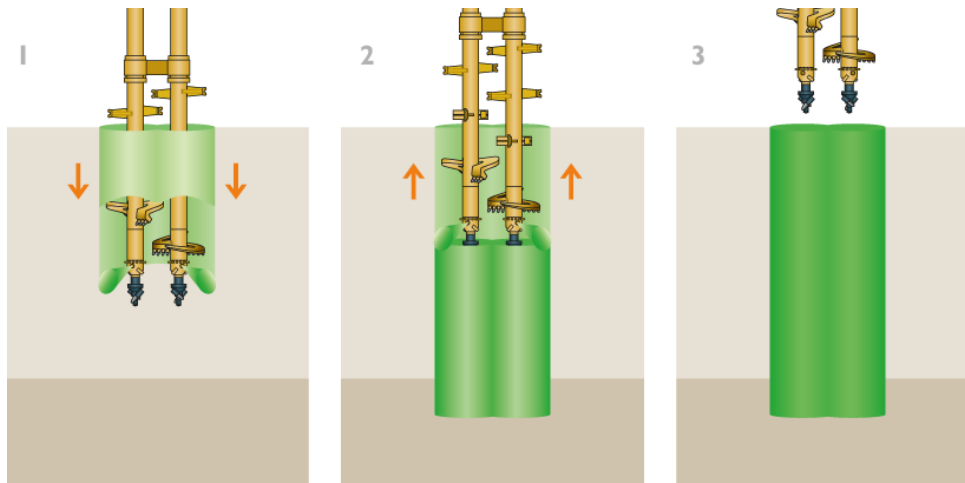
Schematics showing treated columns constructed by twin-shaft Deep soil mixing equipment (source: Keller group)
